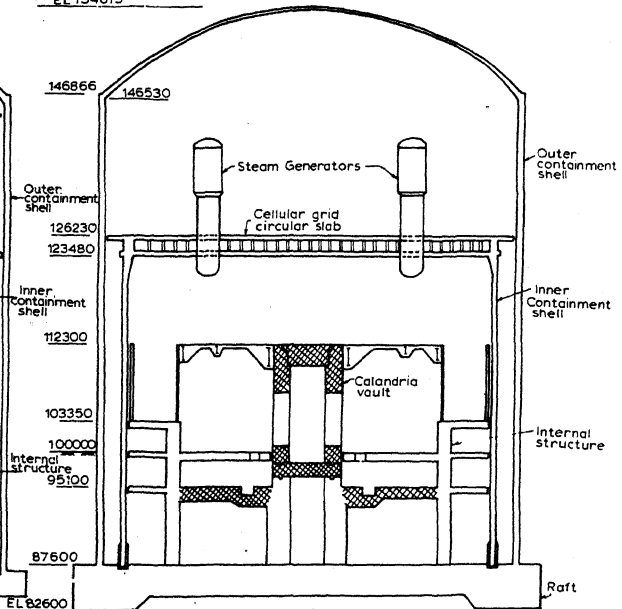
SECTIONAL ELEVATION OF EVOLVED STRUCTURE ABOUT XX
